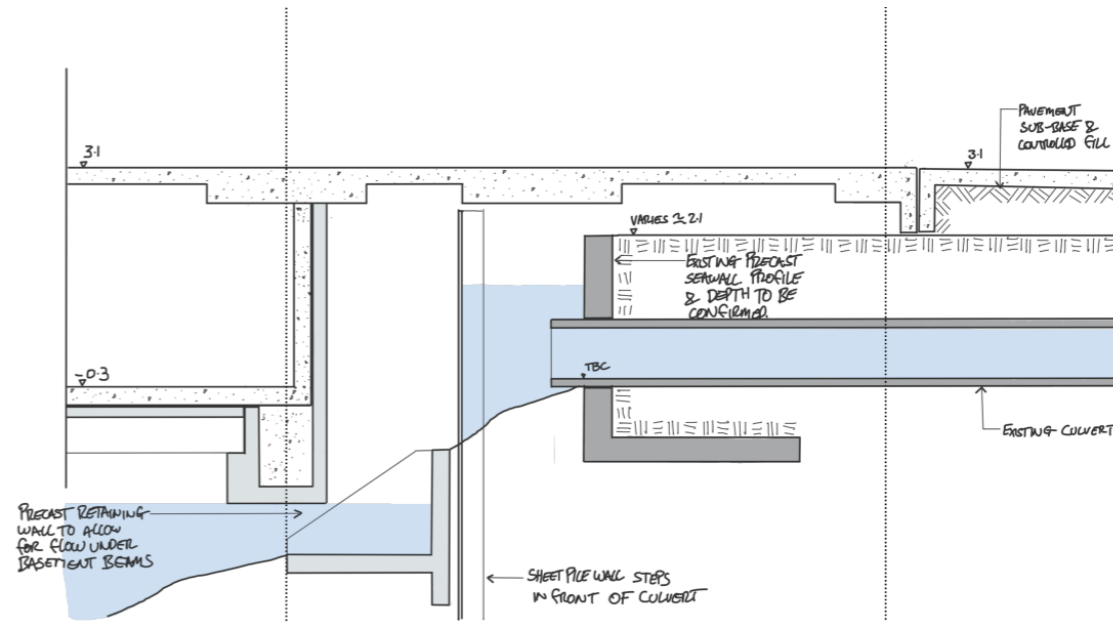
Typical Section Through Culvert that discharges centrally into the facility
